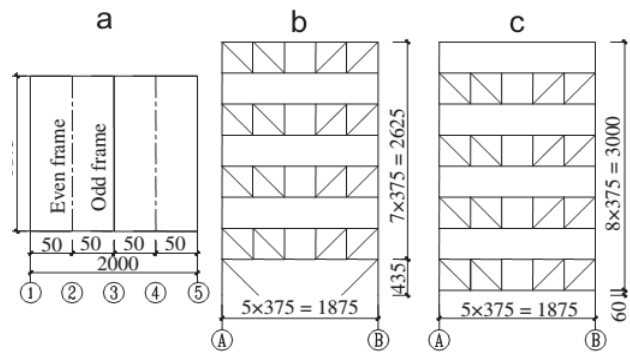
Plan and elevation of the structural model. (a) plan layout, (b) odd frame, (c) even frame (mm)
